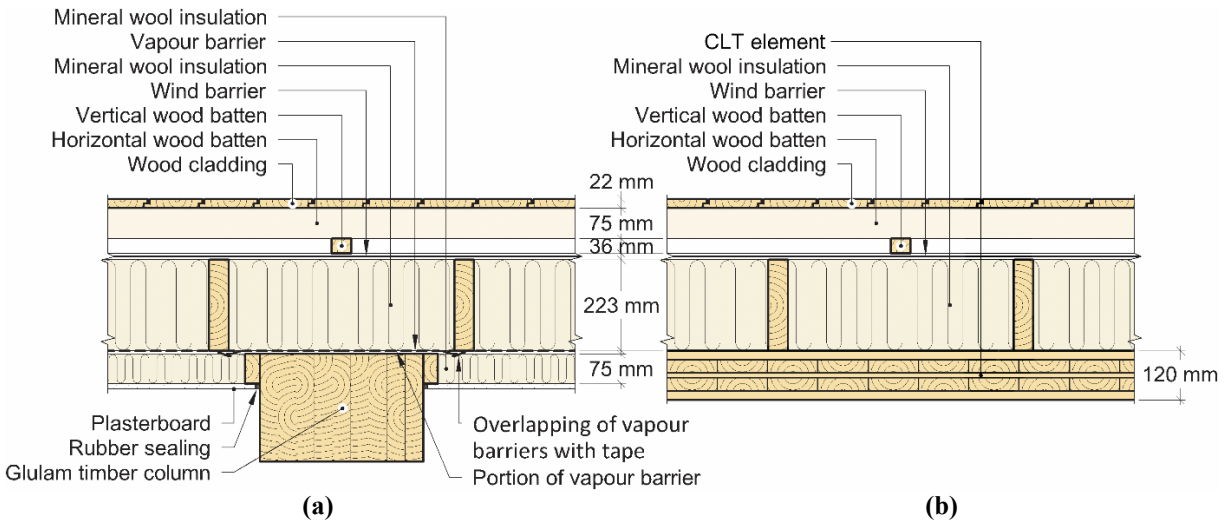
Horizontal section illustration of the two main types of external walls and sealing methods. (a) Insulated timber frame wall and (b) CLT-based wall.
